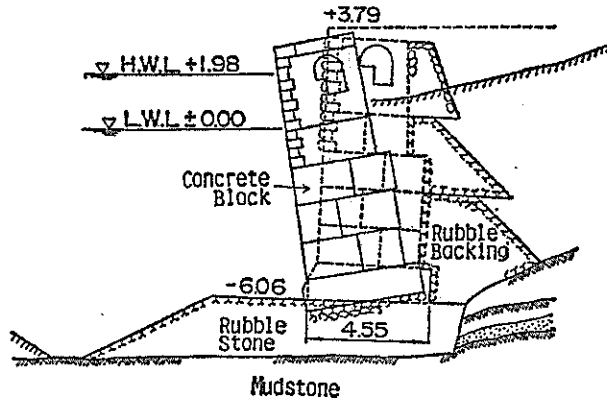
Damage of gravity quaywall (Concrete block type)
